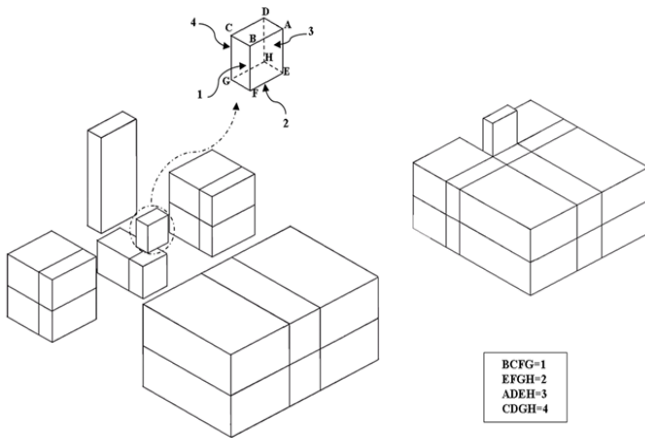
The surfaces with contact elements (bonding and sliding on surfaces 1, 2, 3, sliding on surface 4)
